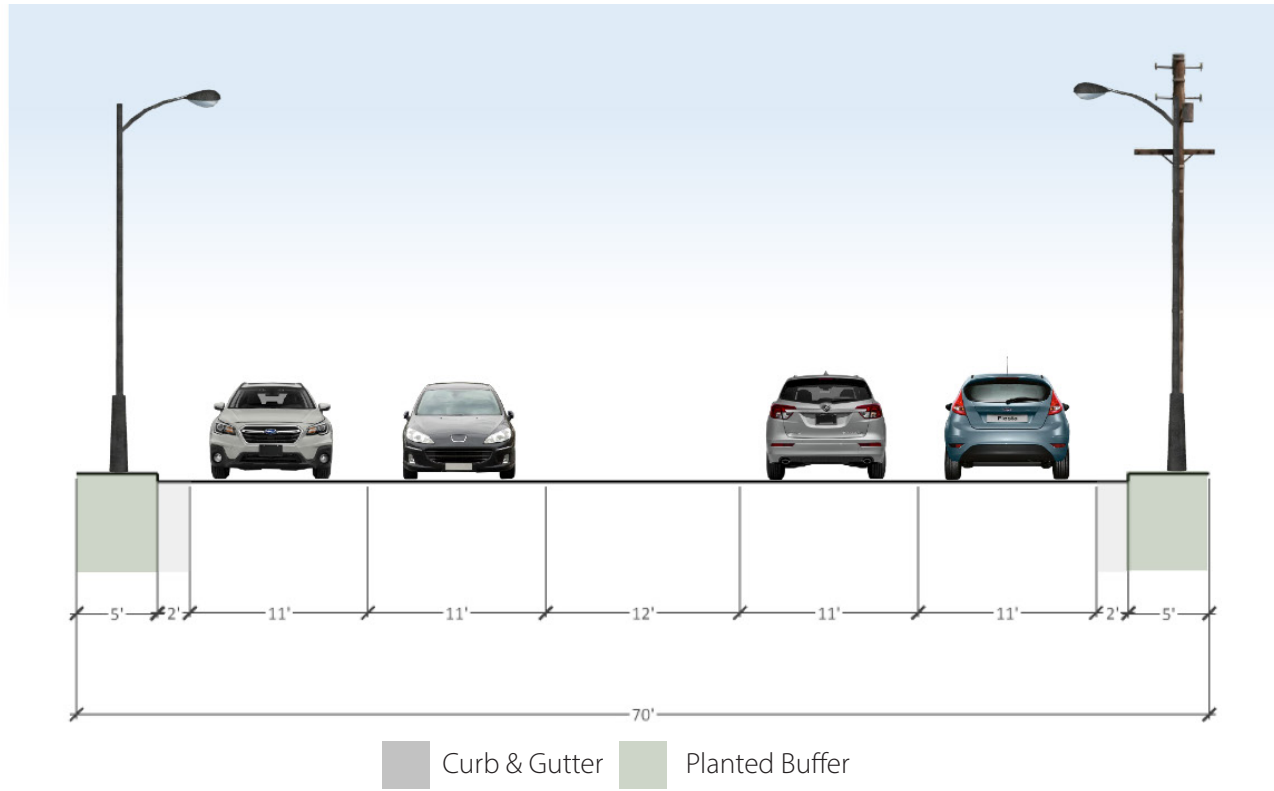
W. Broadway Street Existing Cross-Section: Segment 2
